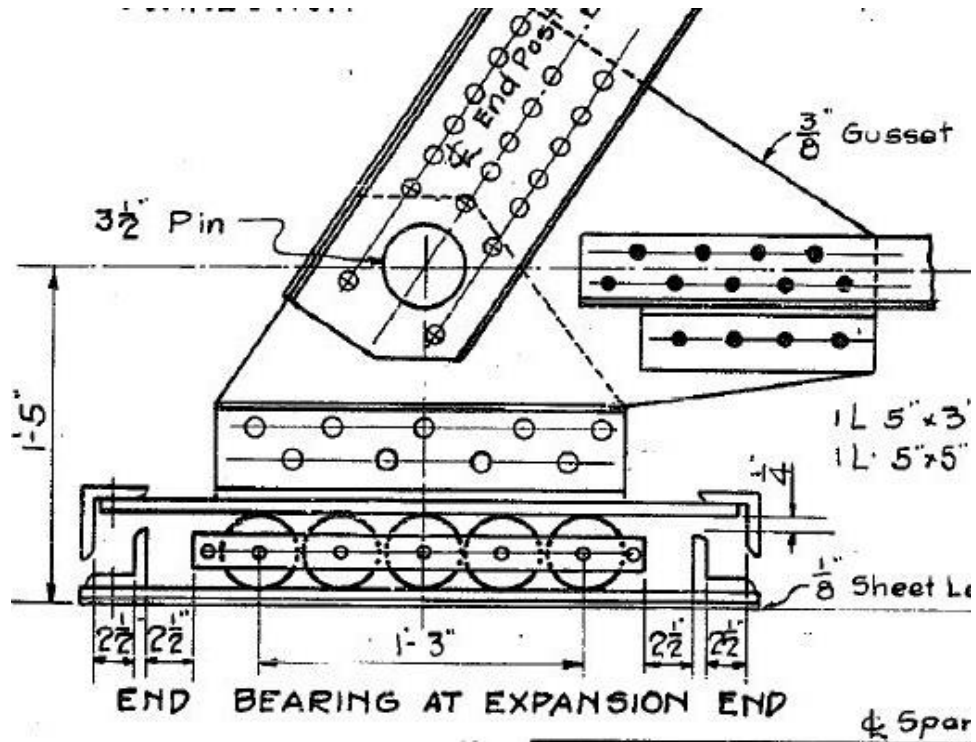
1914 standard truss bridge plan, showing roller bearing detail typical on standard truss bridges prior to 1915. Plan sheet courtesy of WisDOT.
